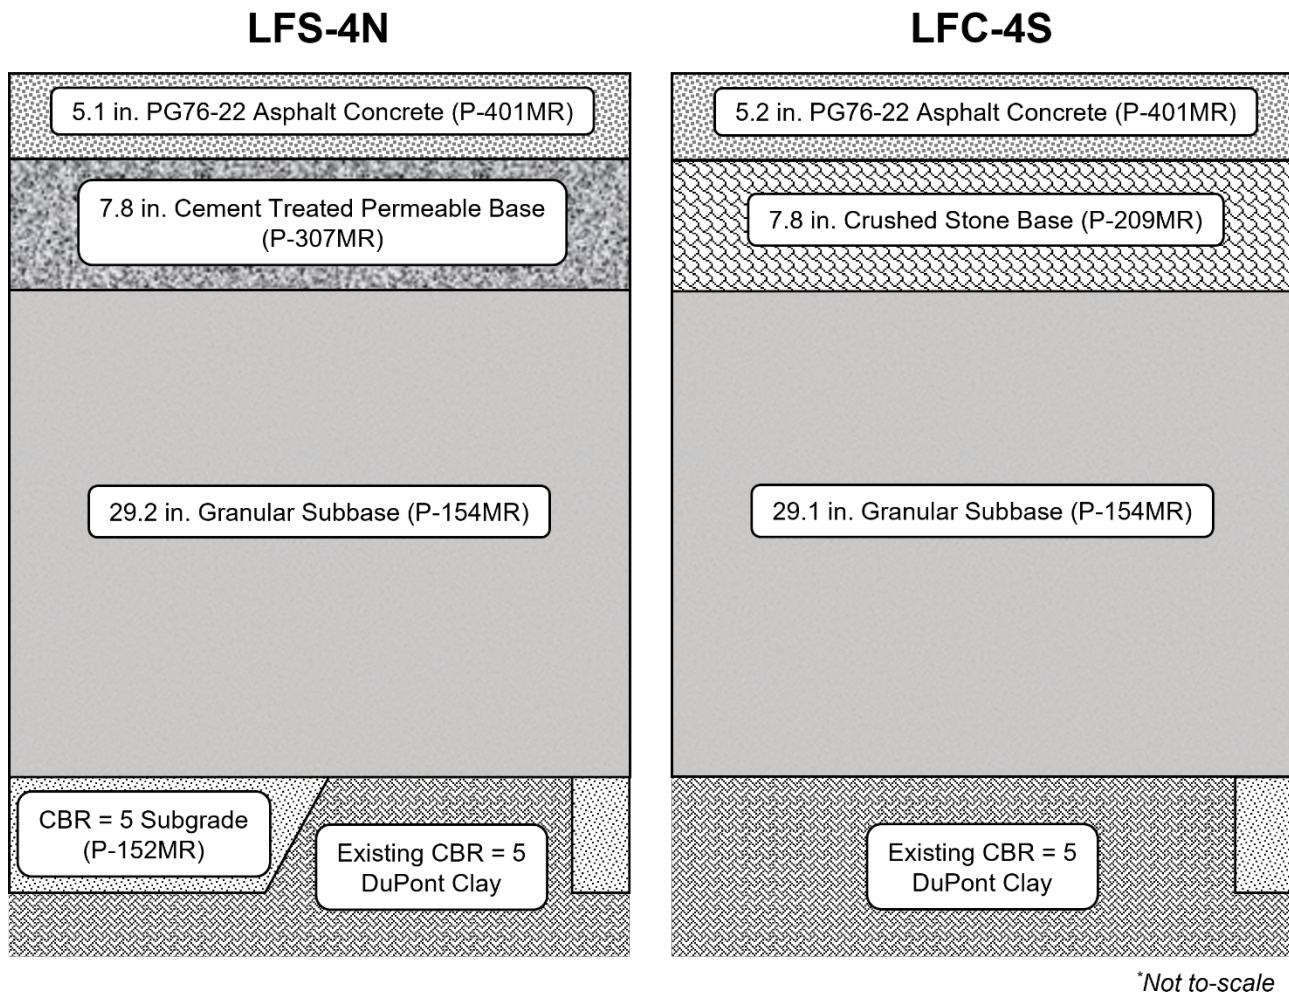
Pavement Structural Cross-Sections of CTPB Test Items
